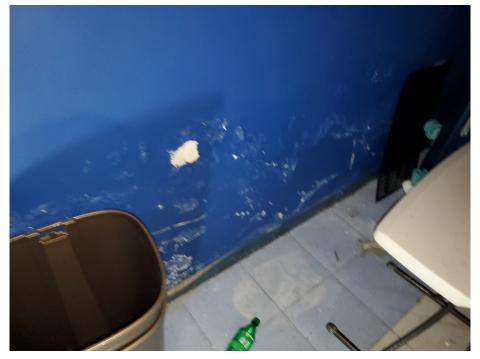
Representative view of water damage on eastern wall of second floor auditorium projection room.
